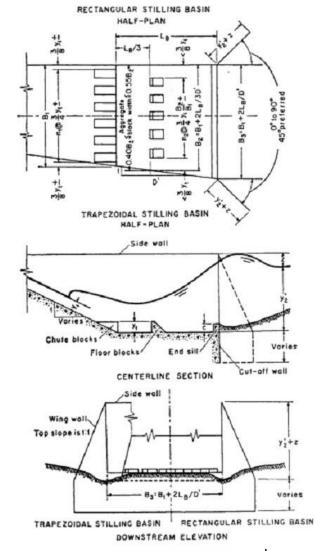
SAF Stilling Basin. (Source: Blaisdell, 1948)
